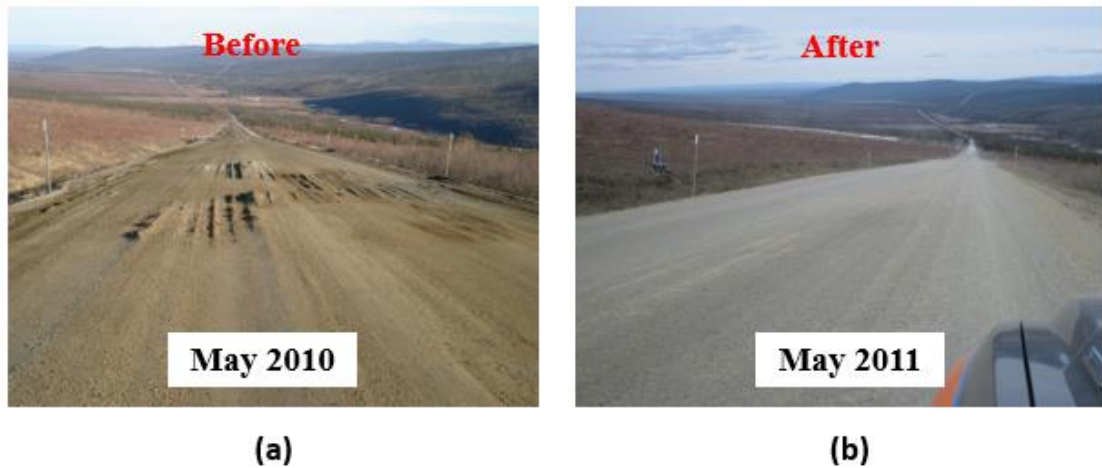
Wicking fabric application to drain water from a road embankment: (a) Before treatment with the wicking fabric, (b) after treatment with wicking fabric.
